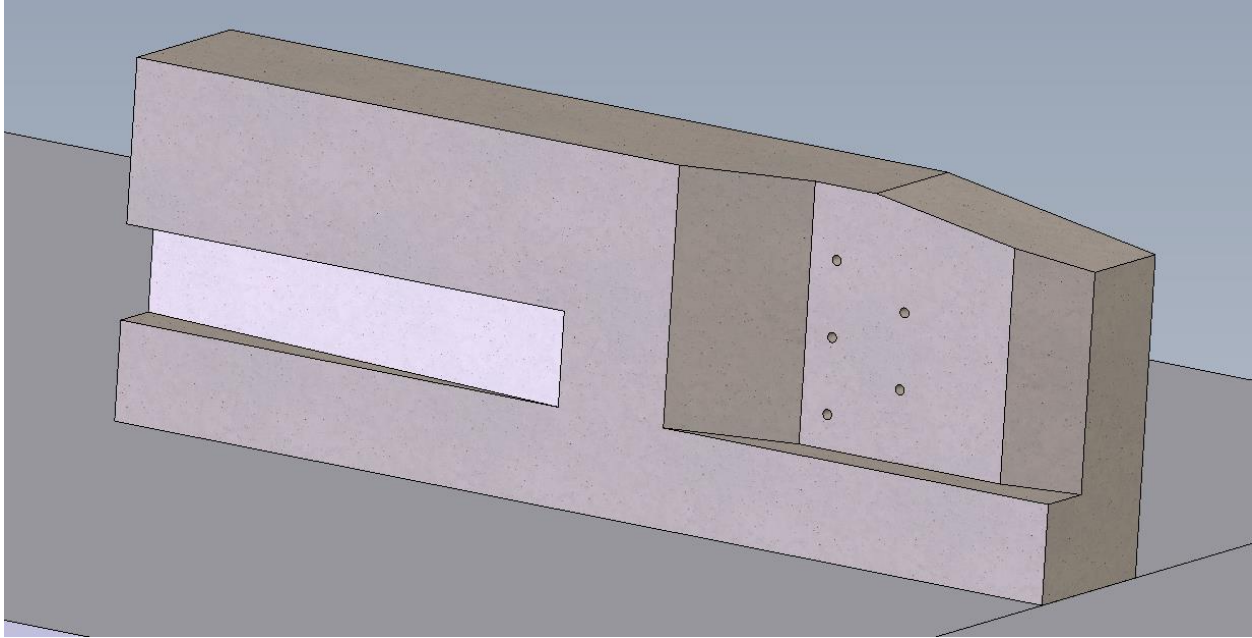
Concrete End Post for Hawaii Concrete Post and Beam Bridge Rail
